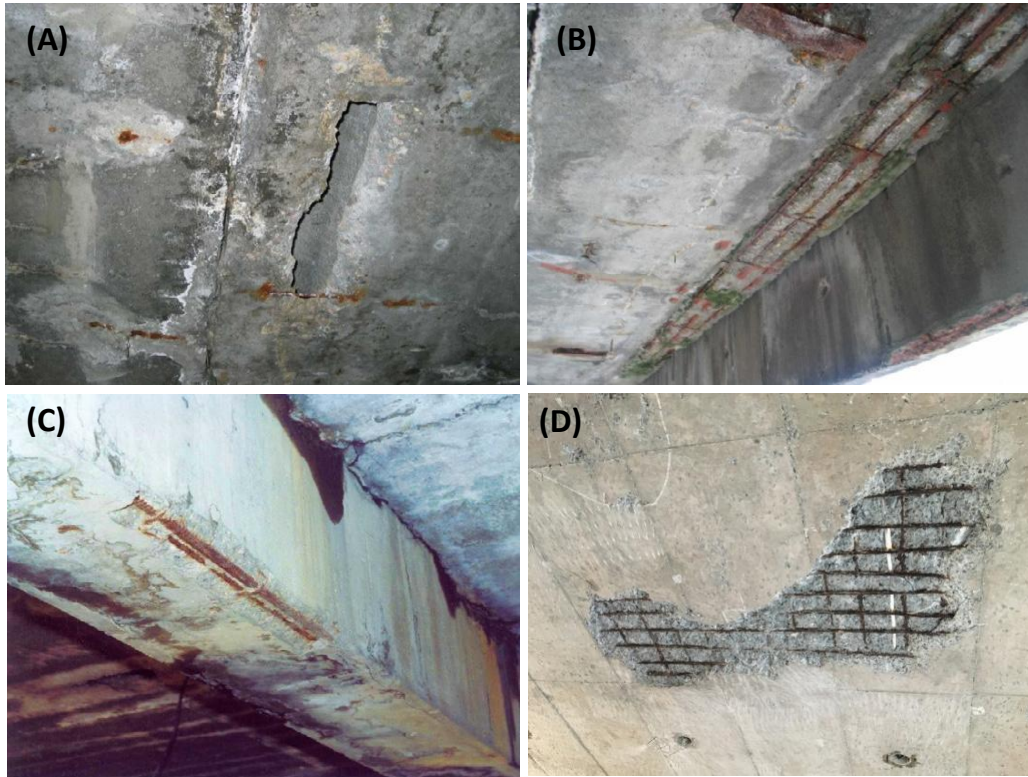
Typical damage of concrete during reinforcement corrosion (A) Floor precast slab (B and C) Beam in car parking structure (D) Slab in residential apartment (Adapted from Berkowski et al. 2013; Vijayalakshmi et al. 2017)
